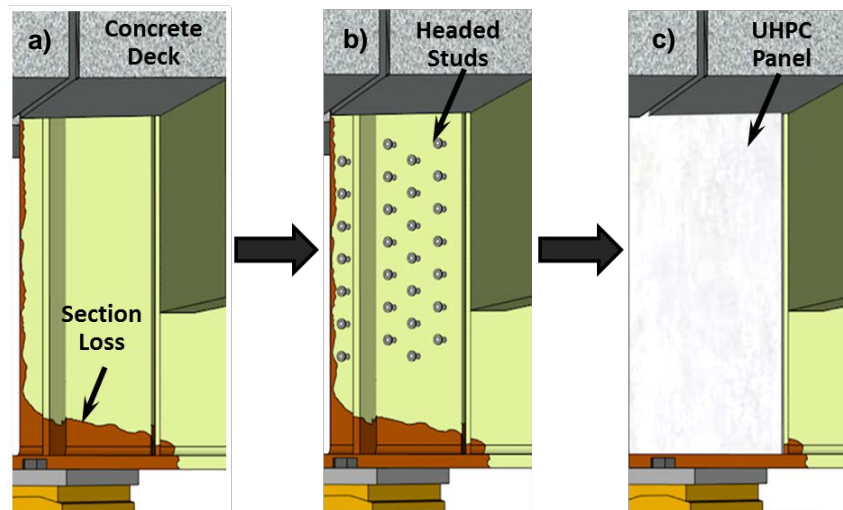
Schematic of UHPC Repair showing a) corrosion at girder end, b) studs welded to intact web plate, and c) UHPC panel cast.
